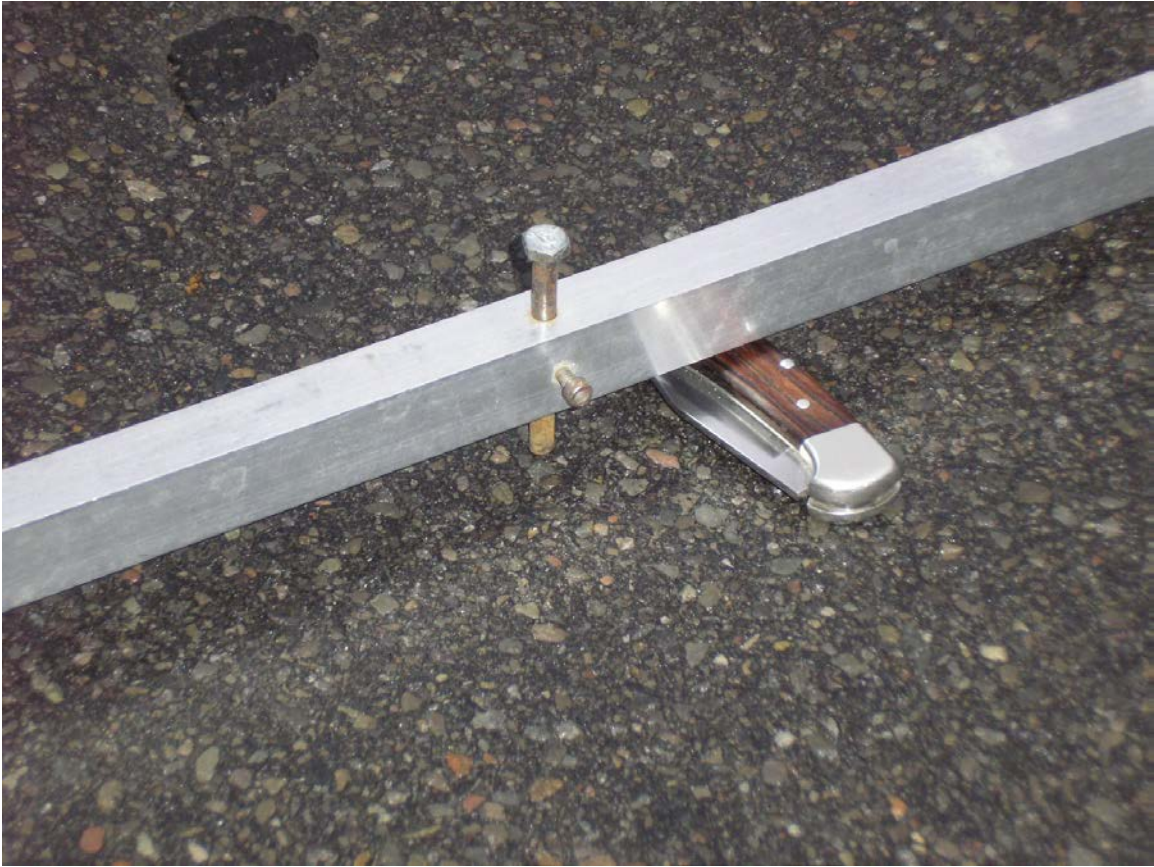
Pavement Rutting in Flushed Pavement Areas in Region 3
